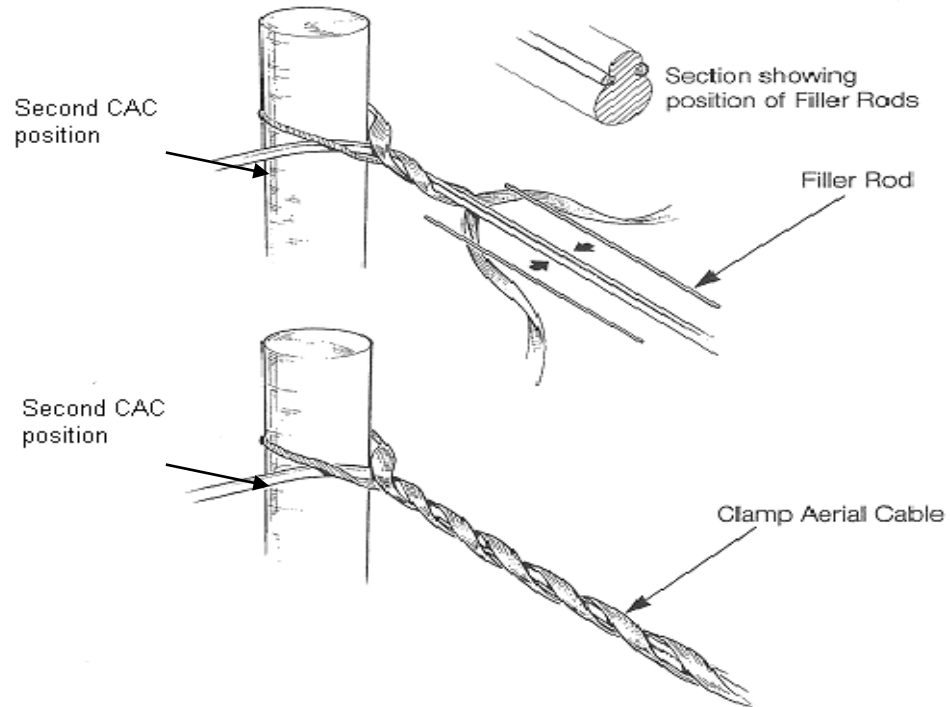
Installation of Clamp Aerial using Cable Filler Rod 1 for Optical Cables.
